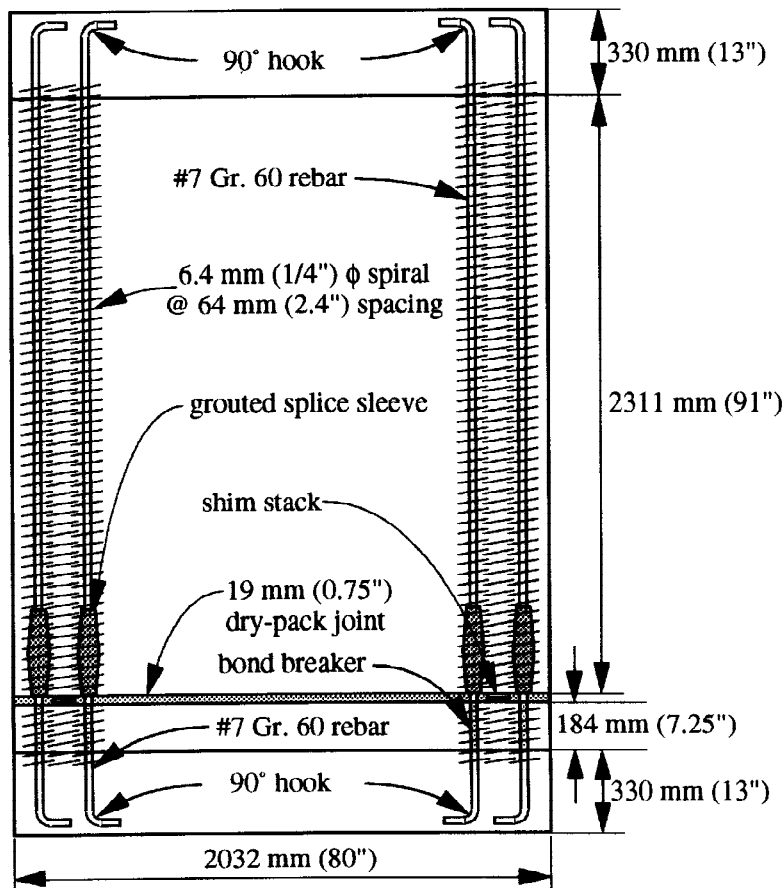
Grouted splice sleeve (GSS) specimen detail
